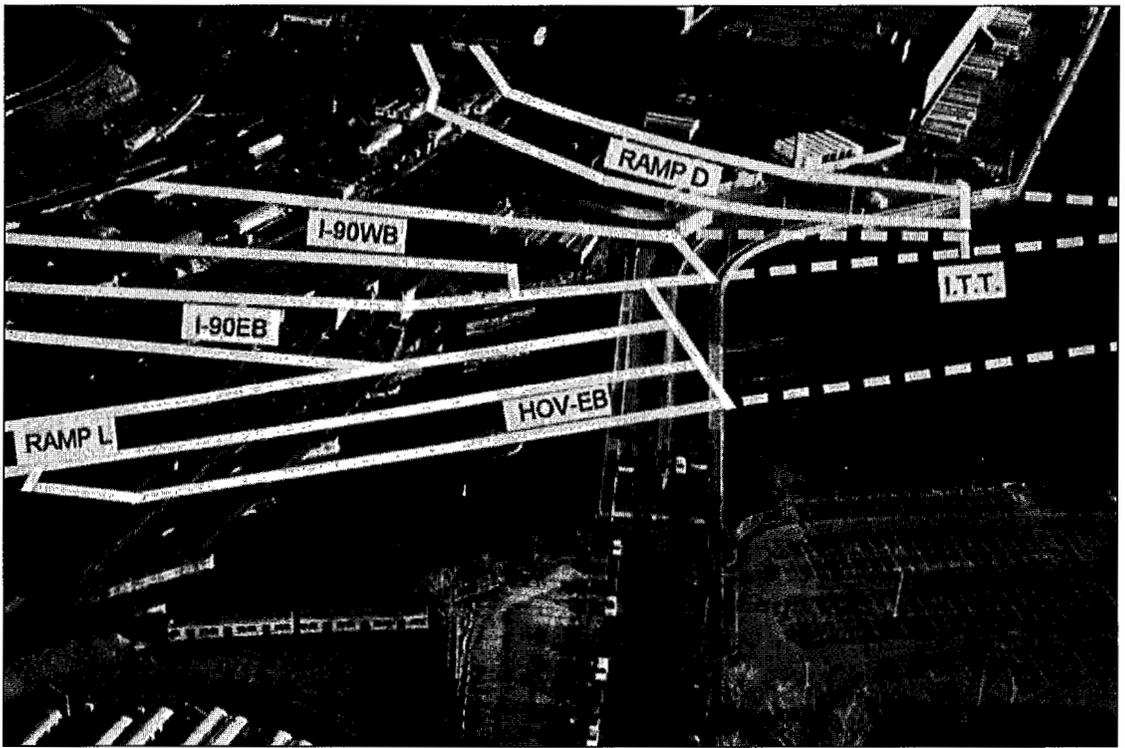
Site photo showing the tunnel location in preconstruction Fort Point Channel.
